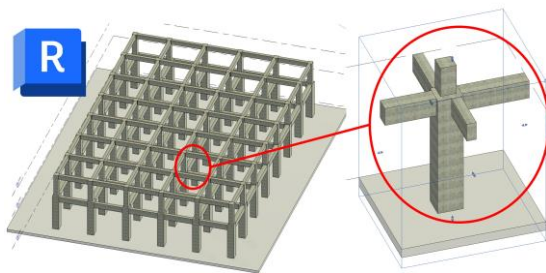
Reinforced concrete frame structure used as the validation model, created in Revit 2025
